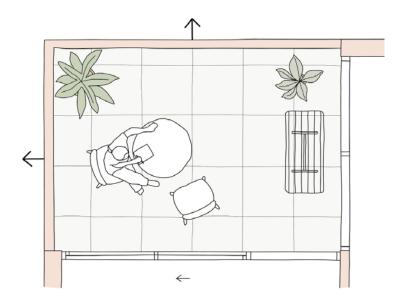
Generously sized balconies allow for outdoor gatherings, dining, and personal touches such as balcony plants.
